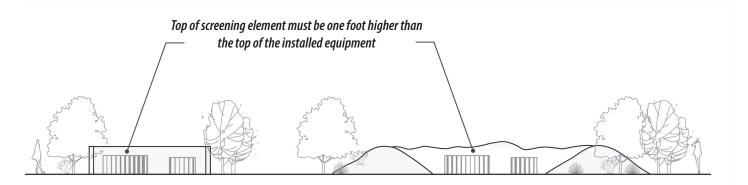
A: SCREENING OF ROOF-MOUNTED EQUIPMENT
